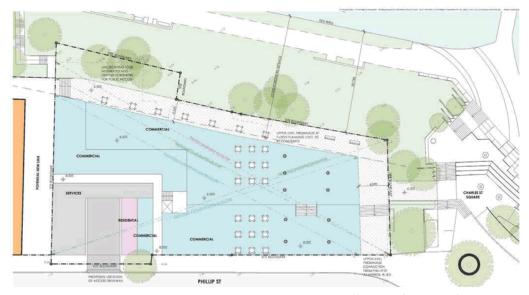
Proposed Ground Floor Plan (Source: PTI Architects)
